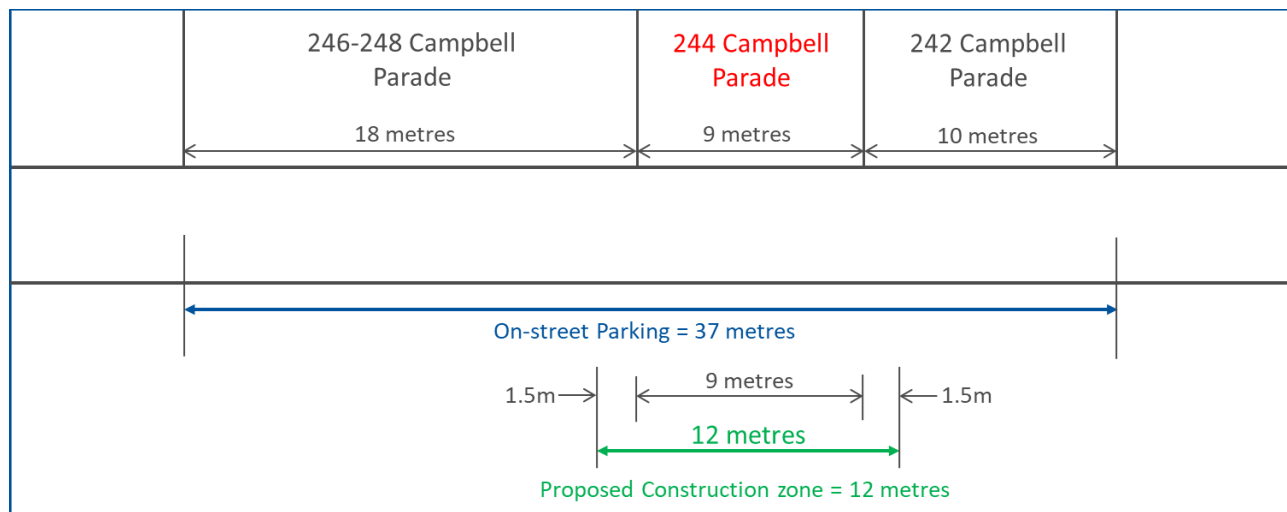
On-street parking for site and adjacent properties at the rear on Ramsgate Avenue.
